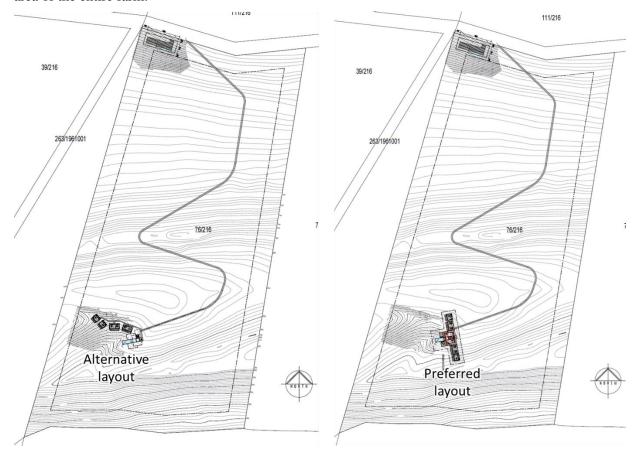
The layout proposed for Uitzicht farm near Brenton on Sean. The southern main dwelling has two alternative layout options proposed by the architects, with the alternative layout depicted on the left and the preferred layout depicted on the right.
